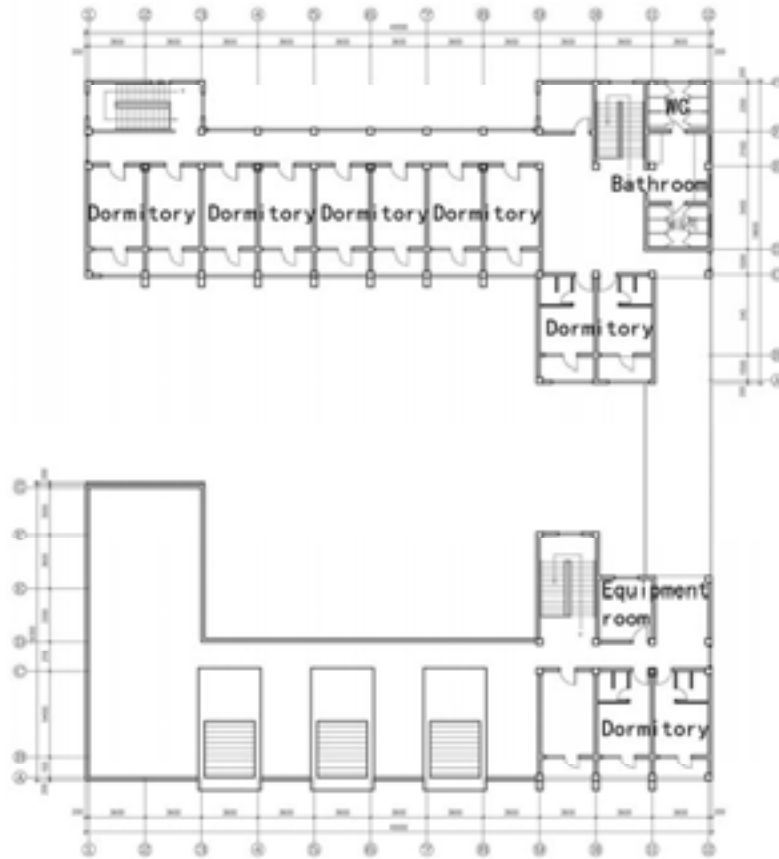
Dormitory building plan on 7.2m level (draw by author)
